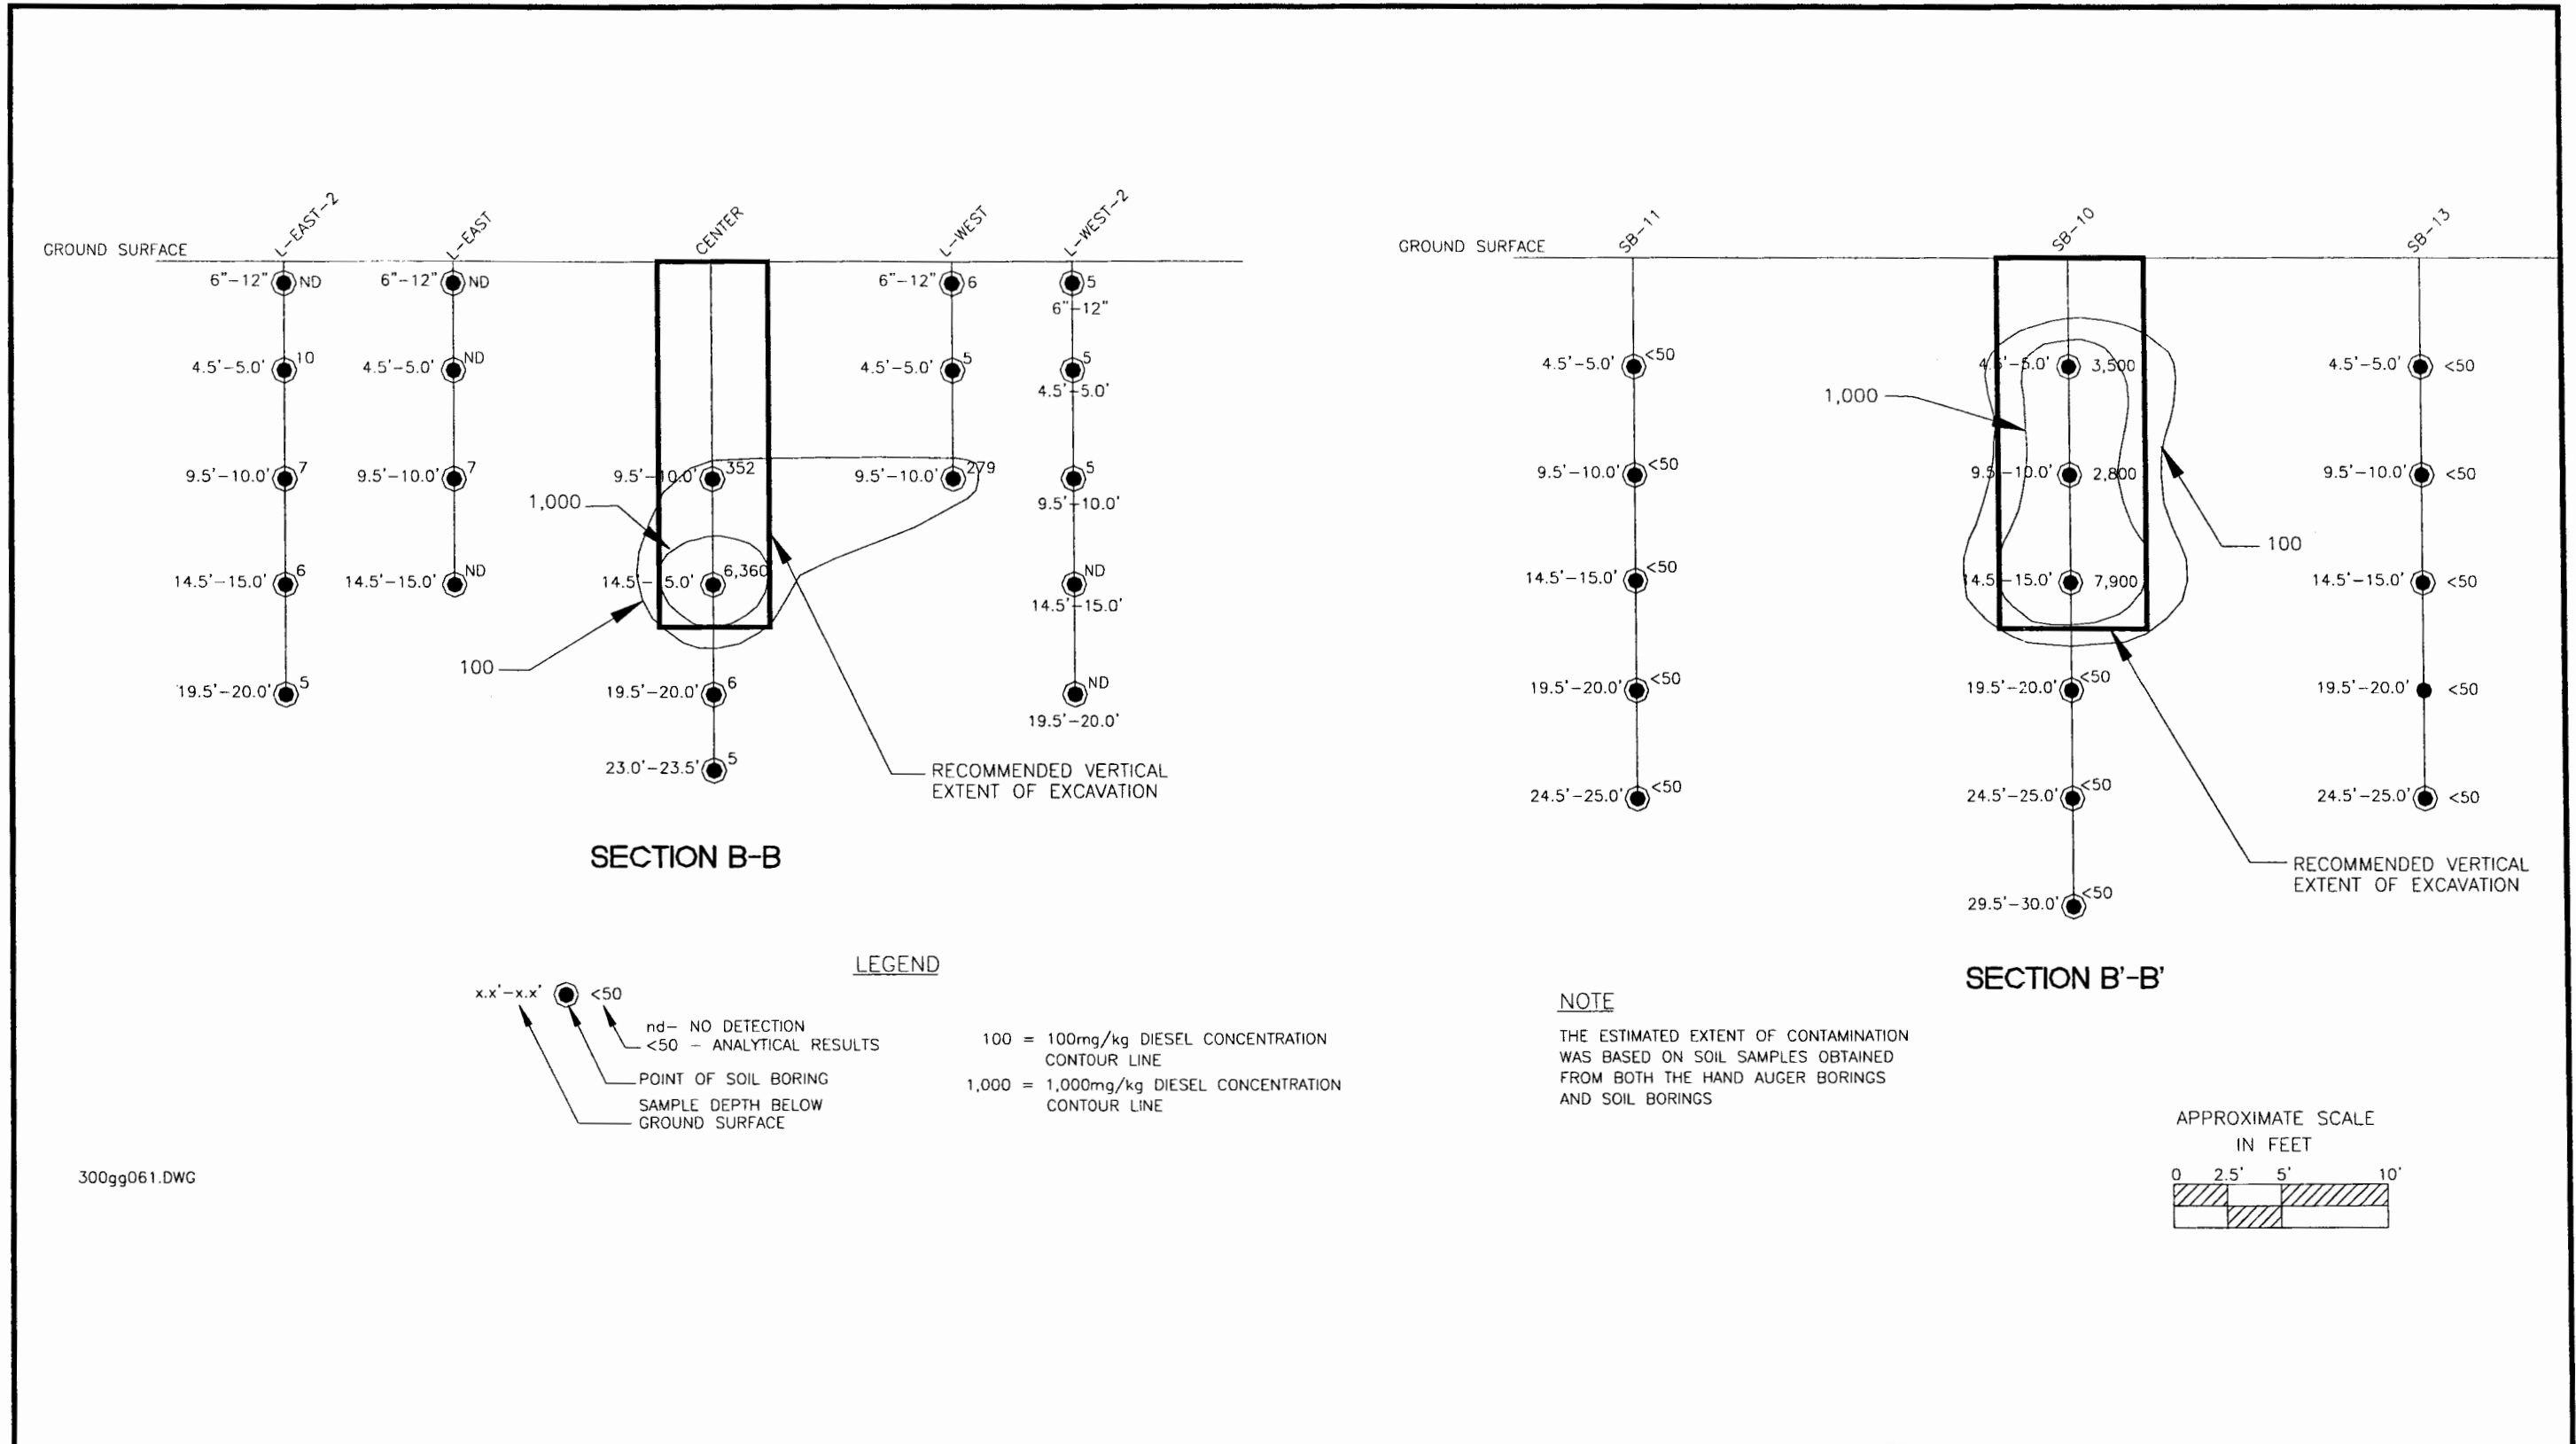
Recommended Vertical Extent of Excavation at Cross Sections B-B and B'-B'
